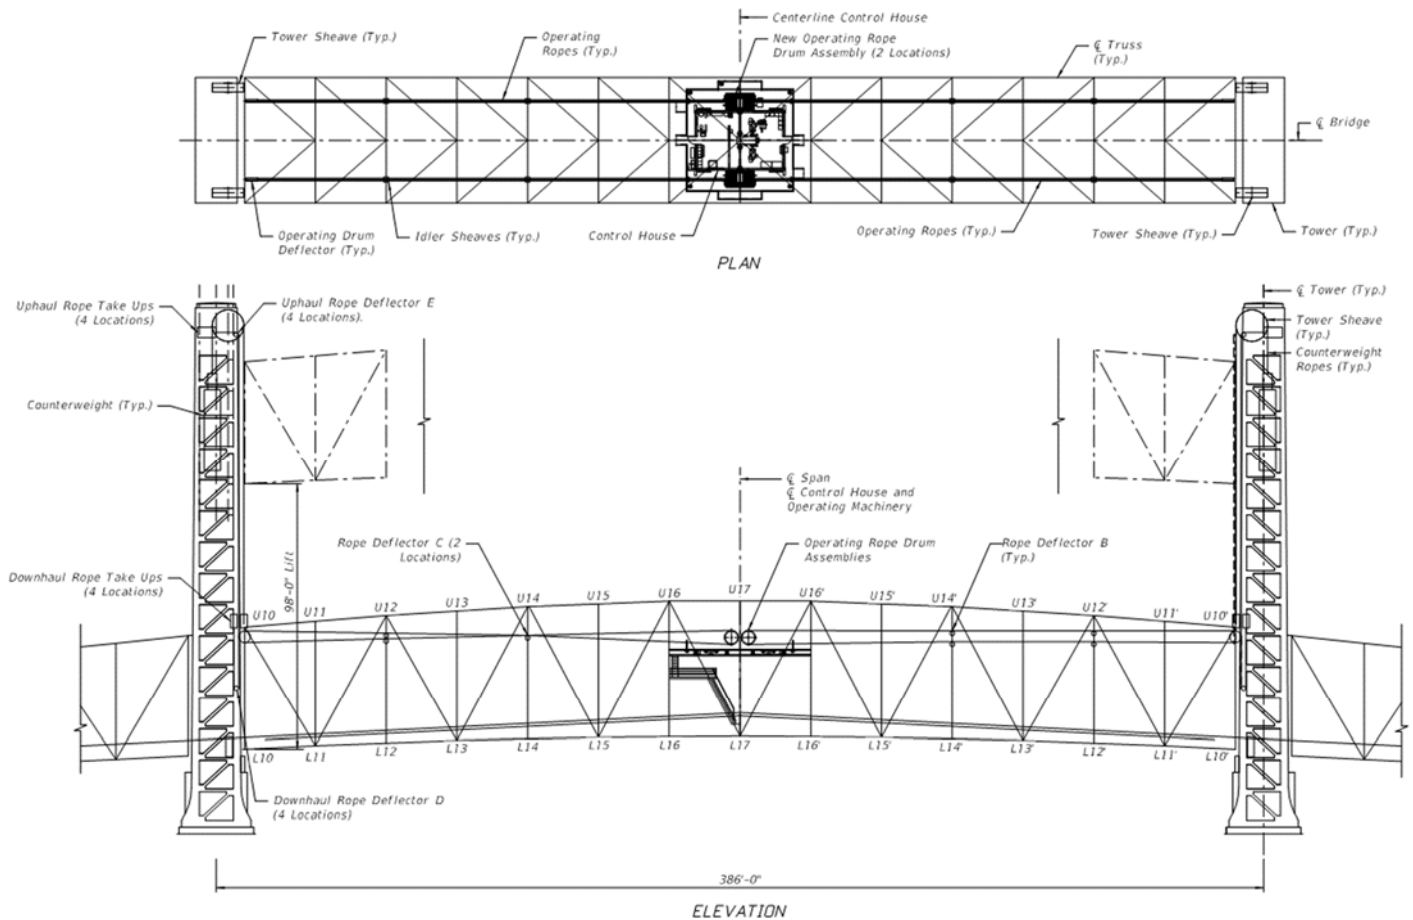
Main Street Vertical Lift Bridge Plan and Elevation
